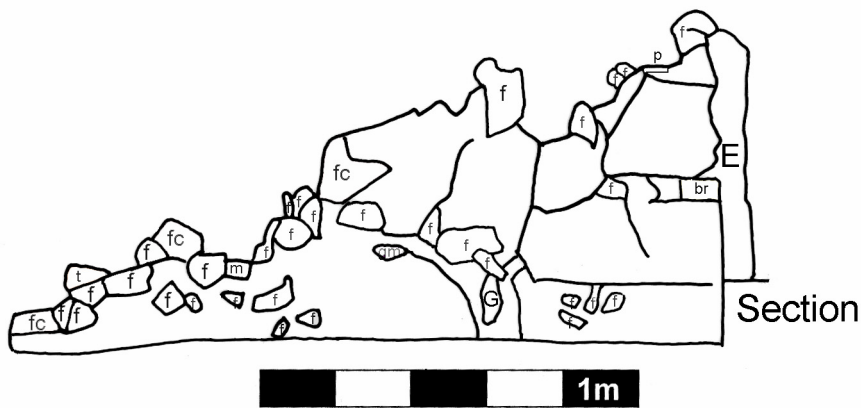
Drawing of the exterior south wall. E = East wall; G = Gap in wall.
